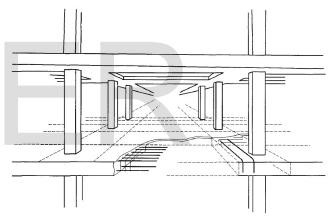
Reinforced Concrete Frame using Wide Beam Column Connection
